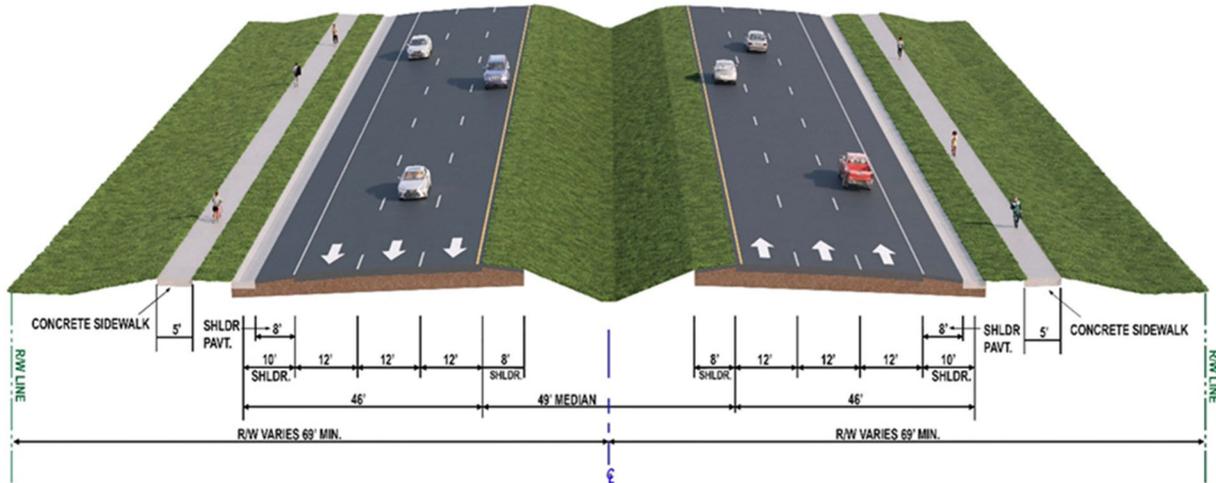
Existing Typical Section – SR 54 One-Half Mile East of 41
